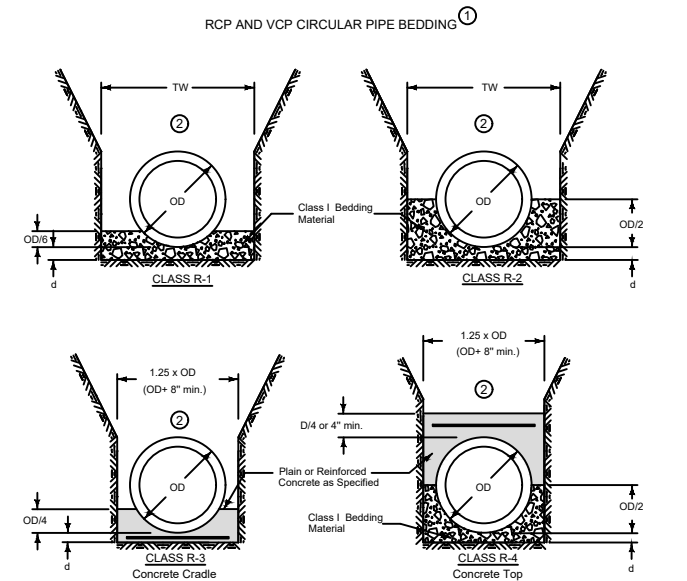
STANDARD ROAD PLAN SW-101 SHEET 1 of 1
